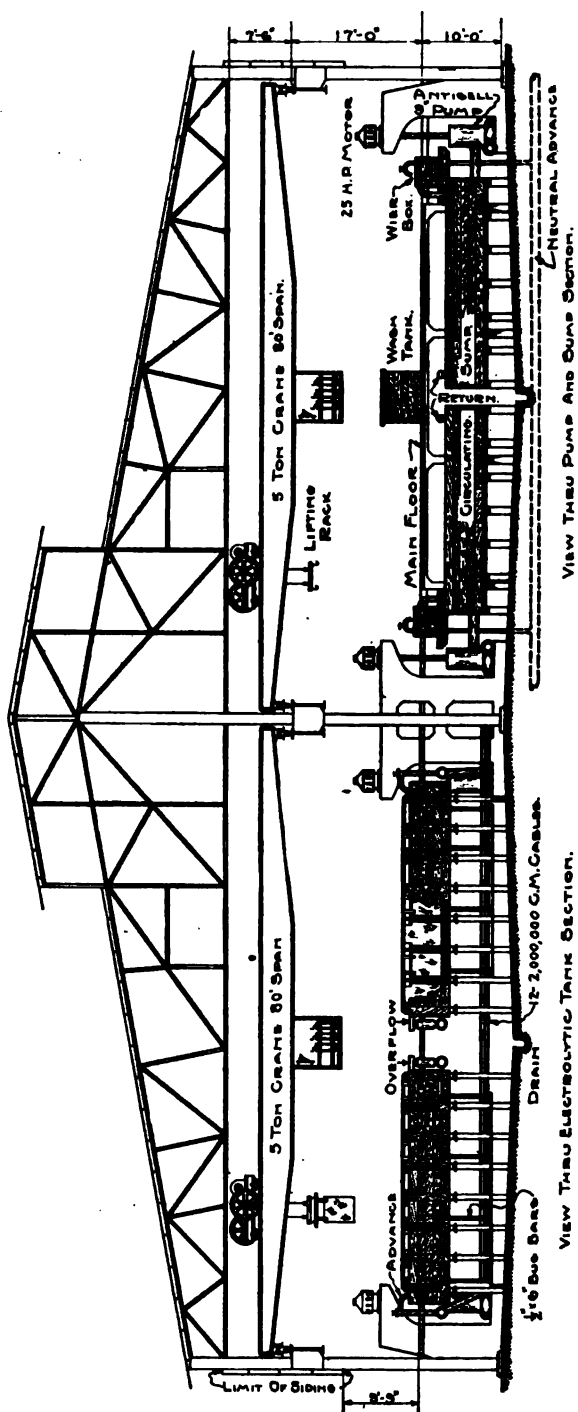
EAST AND WEST SECTION THROUGH TANK HOUSE.
